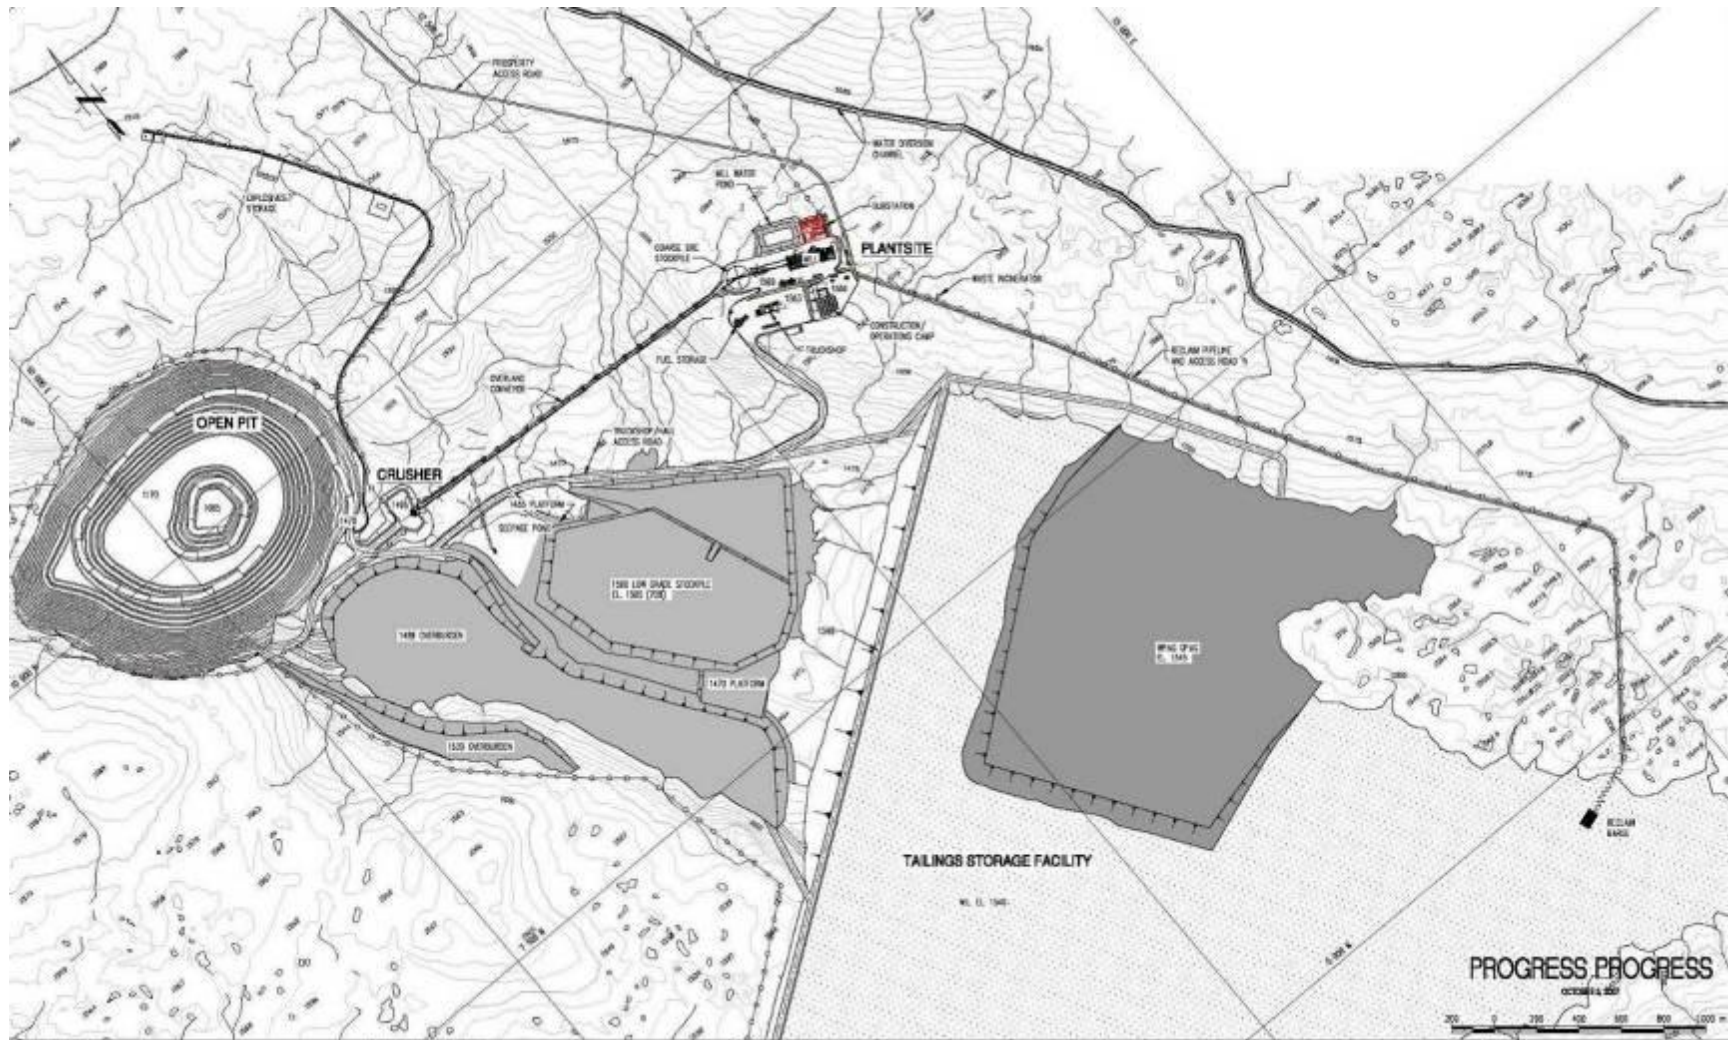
Pit and Stockpiles Plan—End of Year 12
